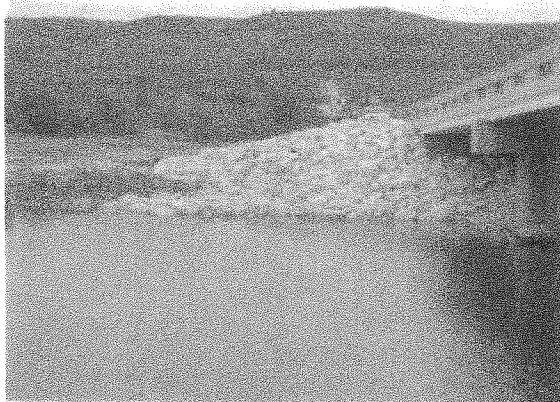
~ Bridge abutment stabilization: Rock riprap armor
